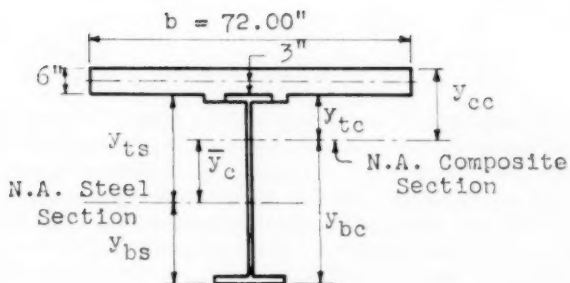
BEAM SECTION FOR EXAMPLE No. 2
